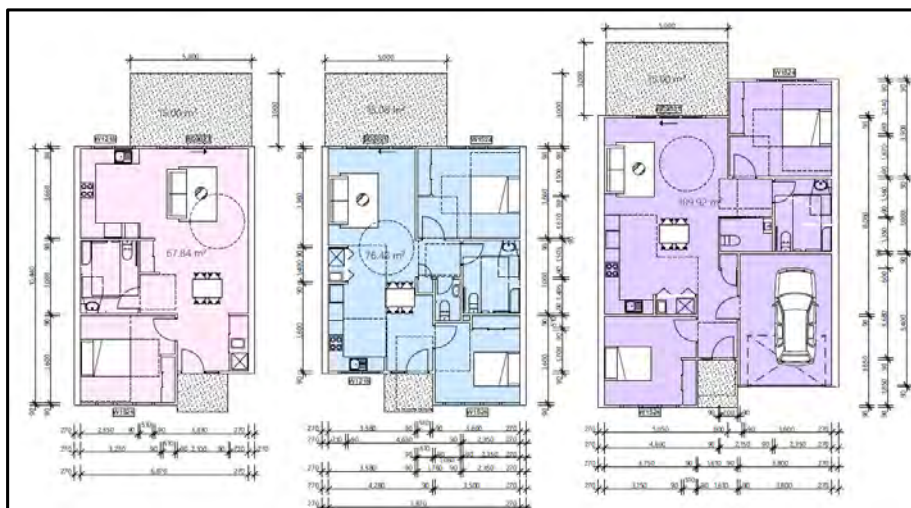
Typical floor plan for one bed, two bed, and two bed with garage units
